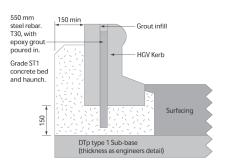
HGV Kerb: HGV with dowel bar detail – typical detail of new installation
